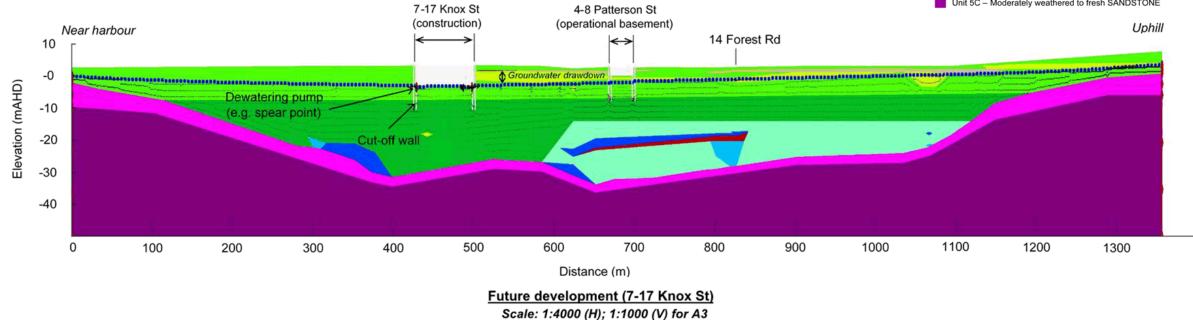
Seepage Analysis showing groundwater drawdown due to the future construction dewatering at 7 – 17 Knox St (Geotechnical Section AA)
